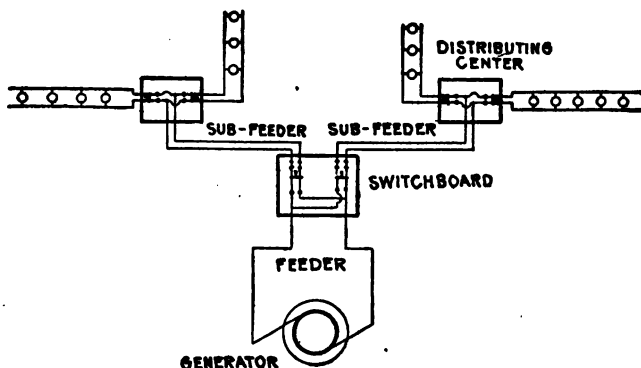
,192.—Two wire parallel system as used with isolated plant.
